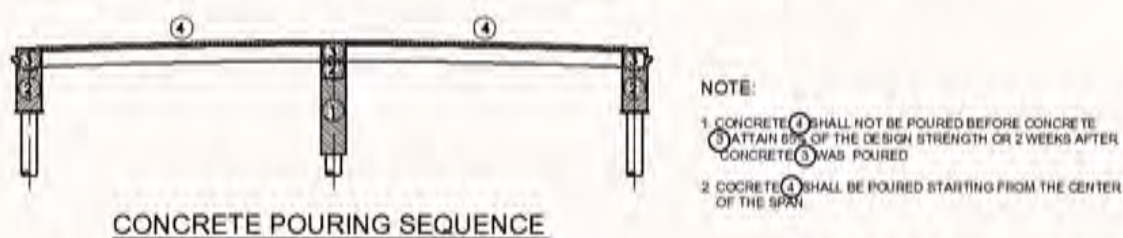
A Sample of Concrete Pouring Sequence of Integral Type Bridge
